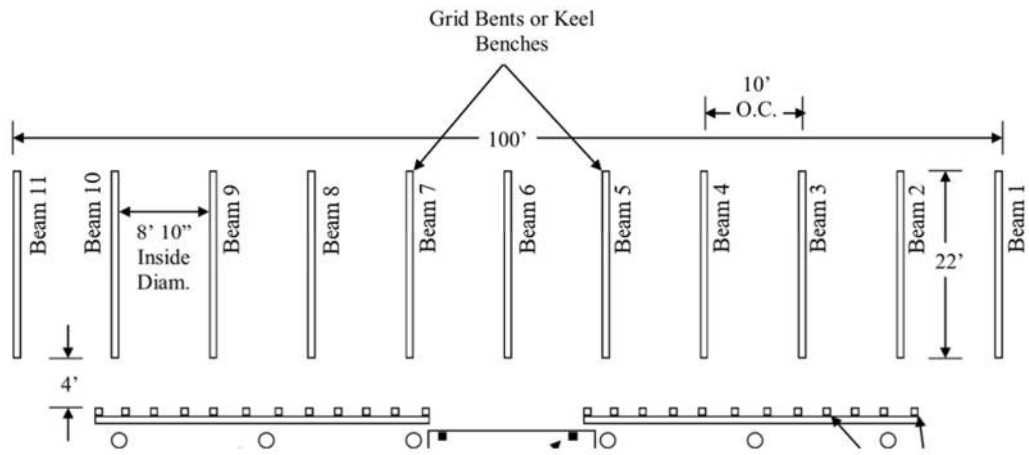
Plan-View Drawing of Beam Layout. Full sheet shown in Appendix A.
